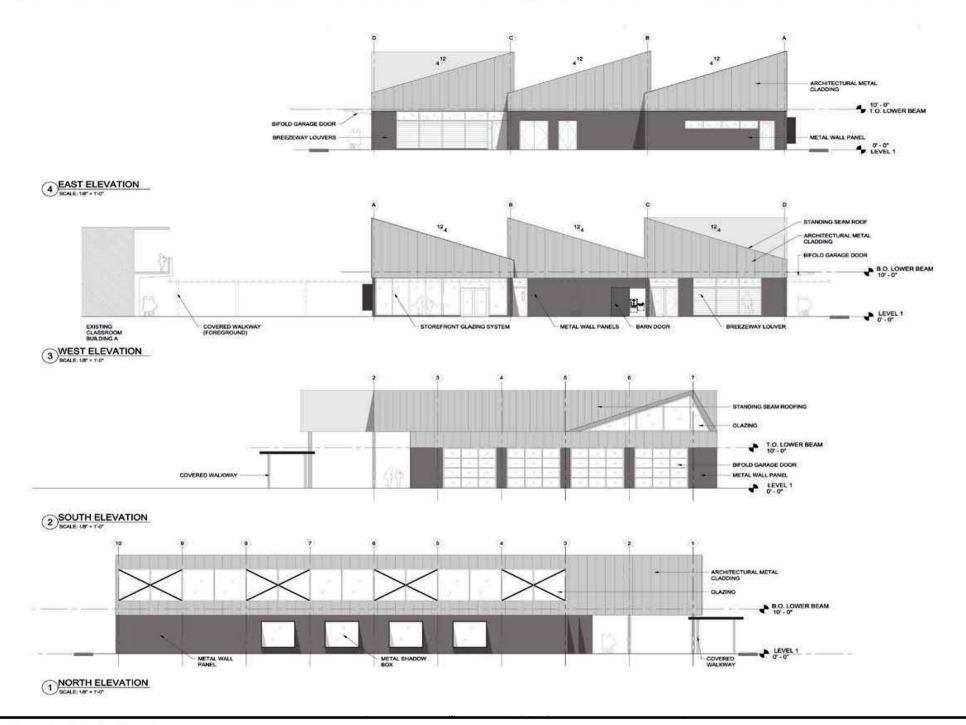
Exterior Elevations Noelani Elementary School New IDEA Center
